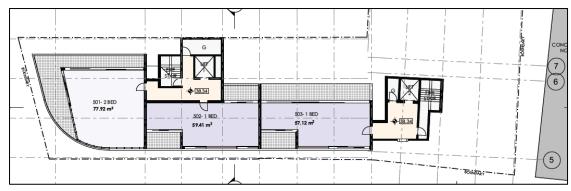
Proposed Level 5 plan. (Source: PTI Architecture Pty Ltd)
